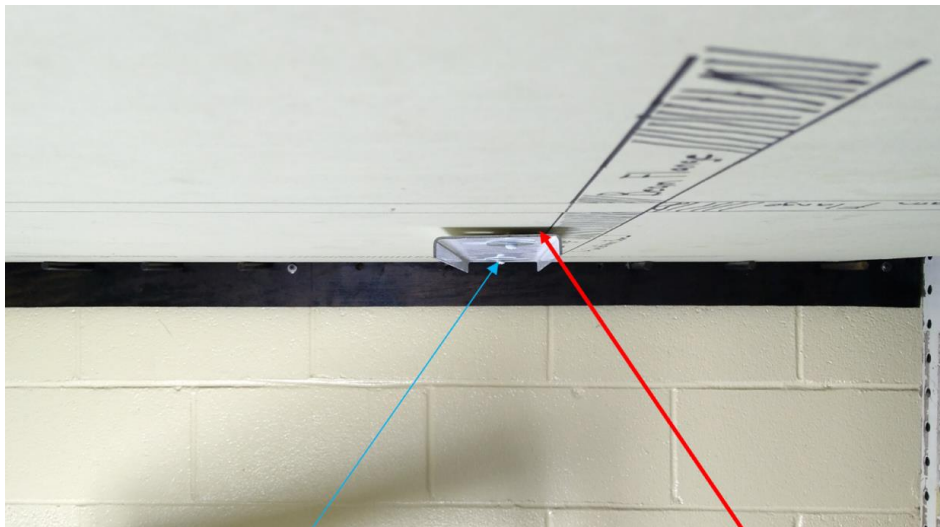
Temporary Retaining Bracket installed - approx. $\frac{1}{8}$ in. gap
